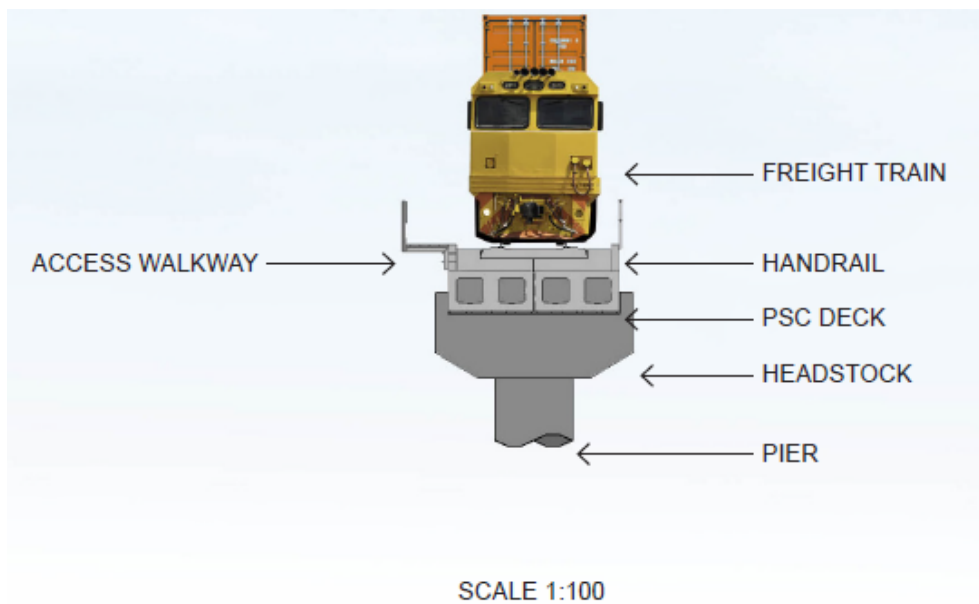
TYPICAL PIER WITH PRE-STRESSED CONCRETE SLAB SPAN
